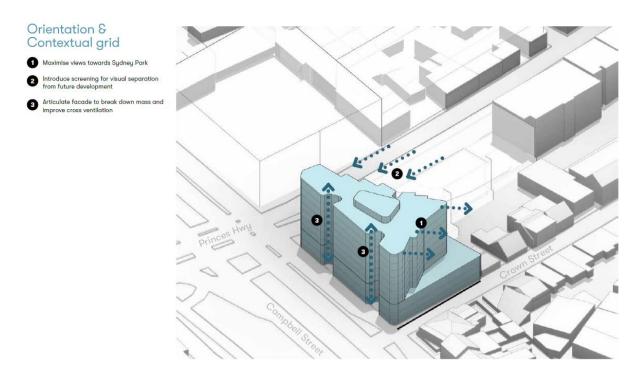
Drawing showing final design with articulated facade to maximise views, break down facade massing and improve cross ventilation. Source: Scott Carver 2023
